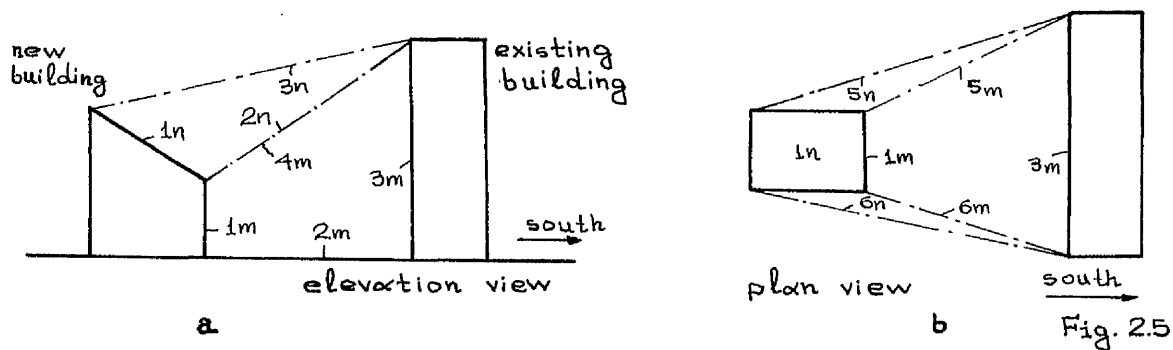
and 2.5b show the plan and elevation view of an existing building and a proposed solar extension. The indices m and n distinguish the two different sub-enclosures.
